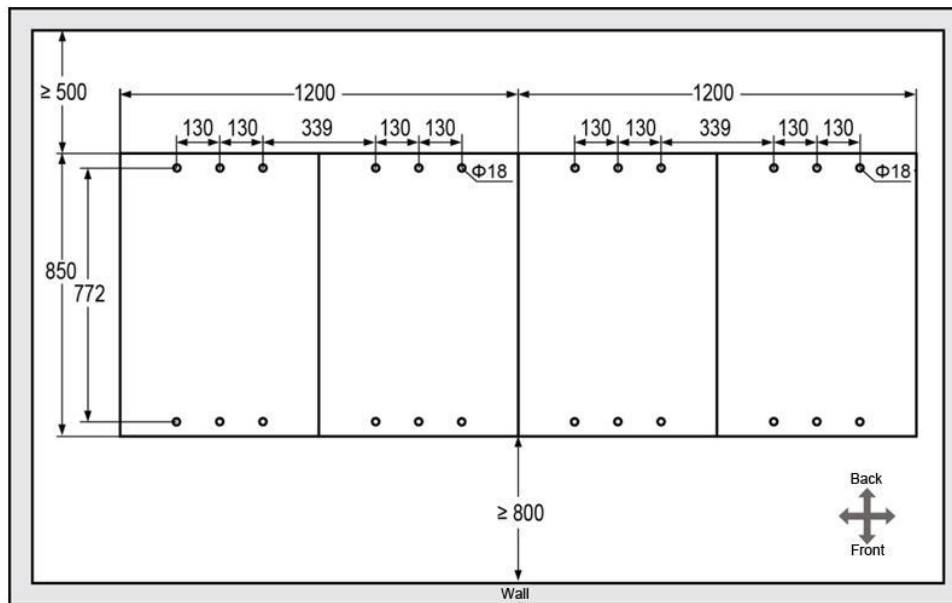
Dimensions of antiseismic kit mounting holes (800 kVA)
